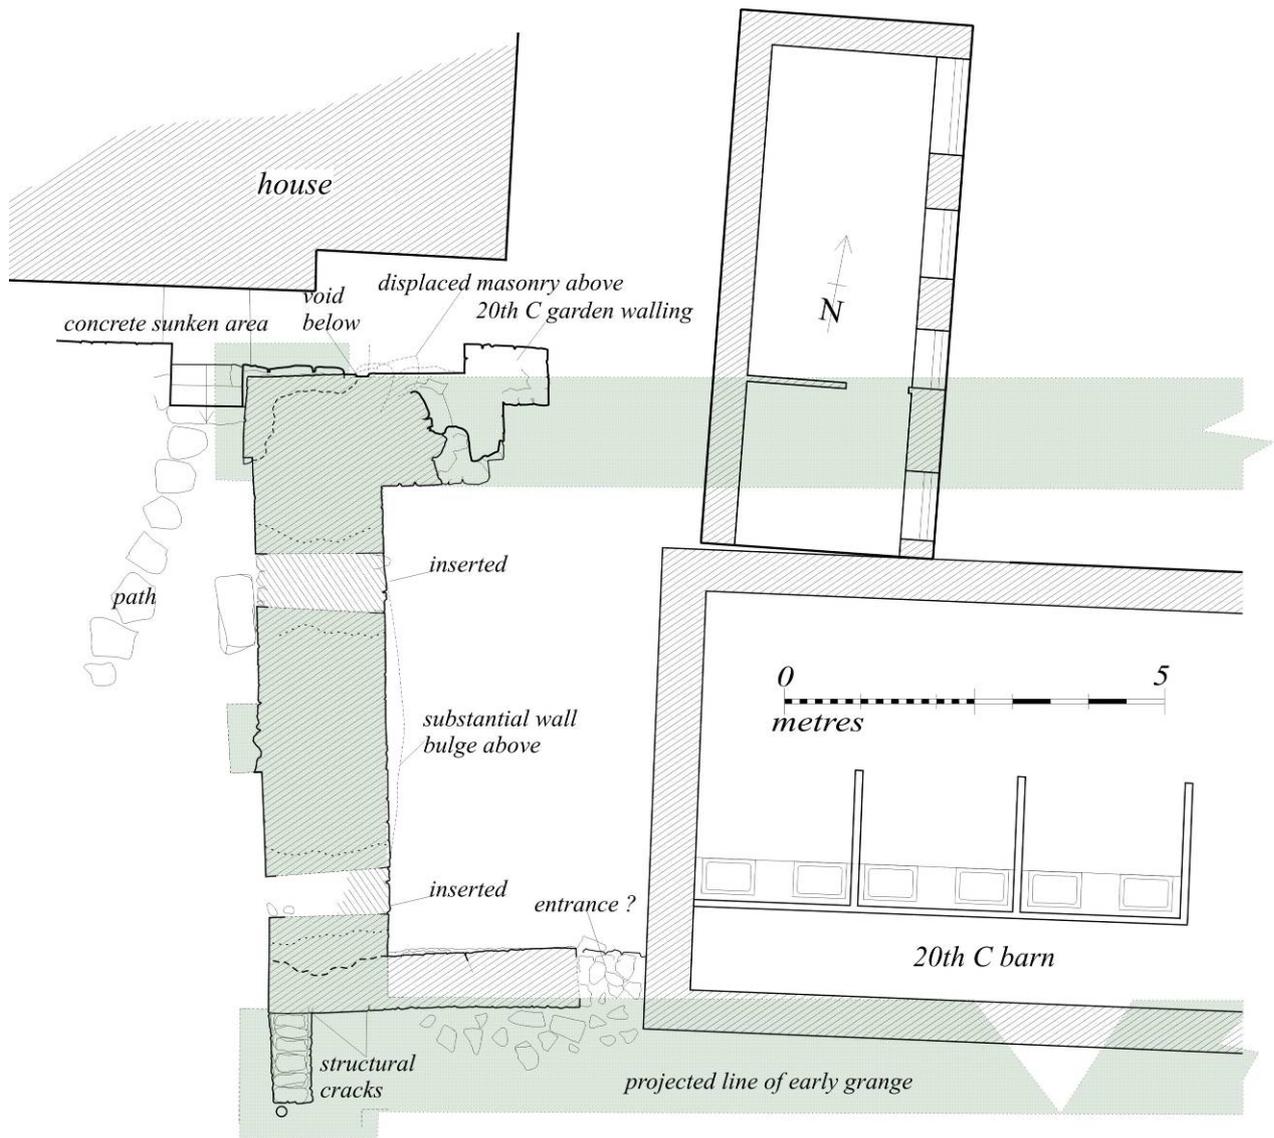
Plan of the west gable wall of the early range; pale blue – projected former extent
